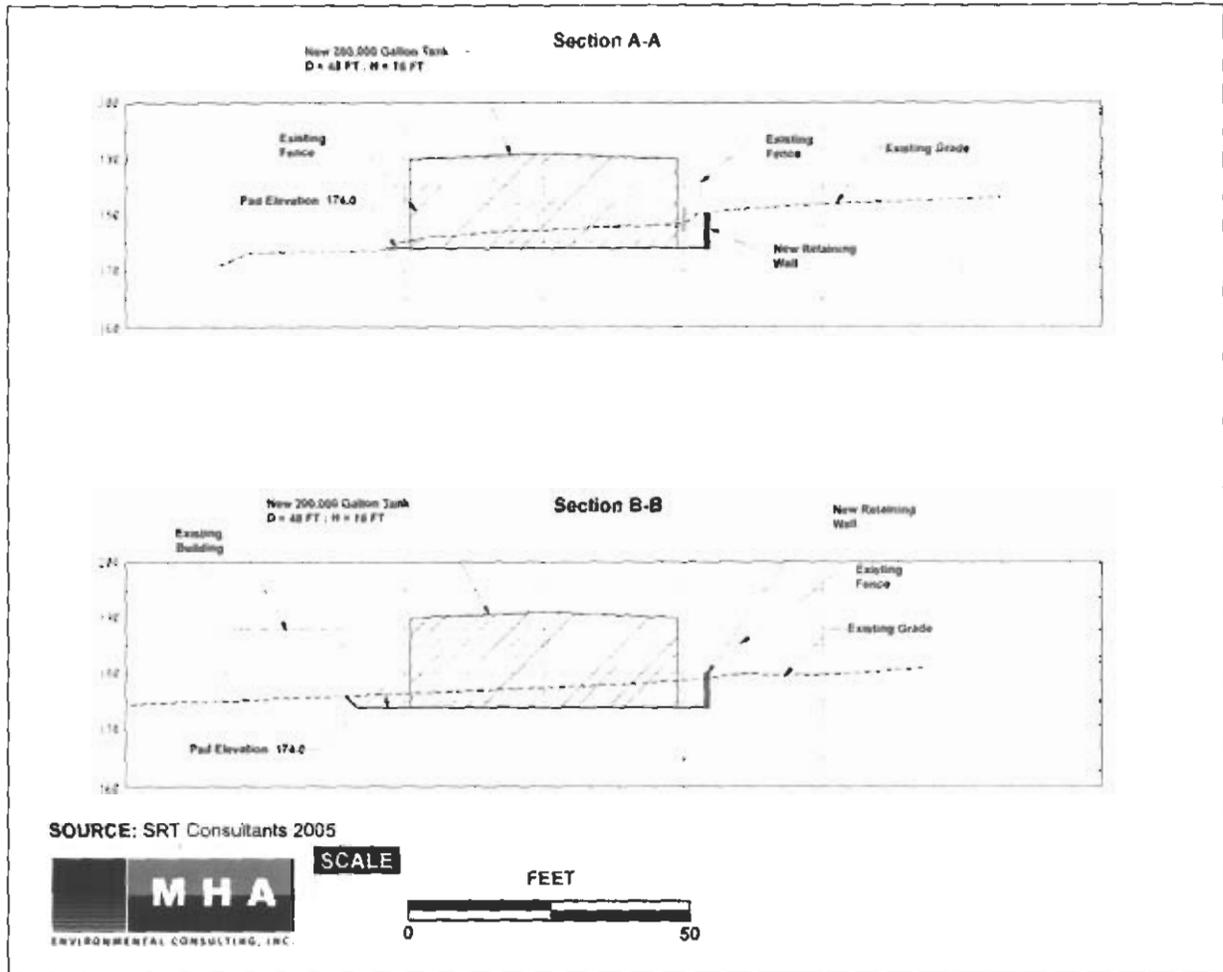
Proposed Schoolhouse Tank Cross-Sections
